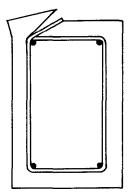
Spalling of Thin Cover Over Stirrups
